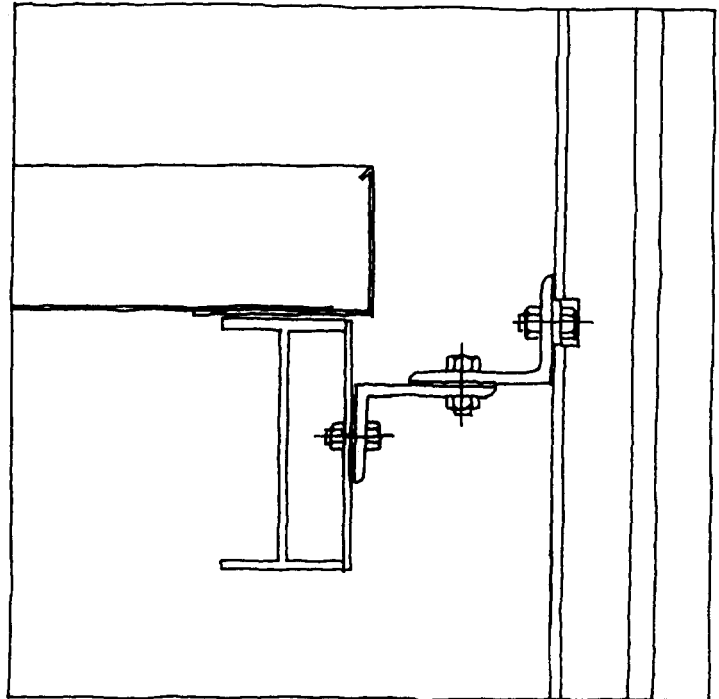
Guide rail connection to edge beam based upon outstand angle
